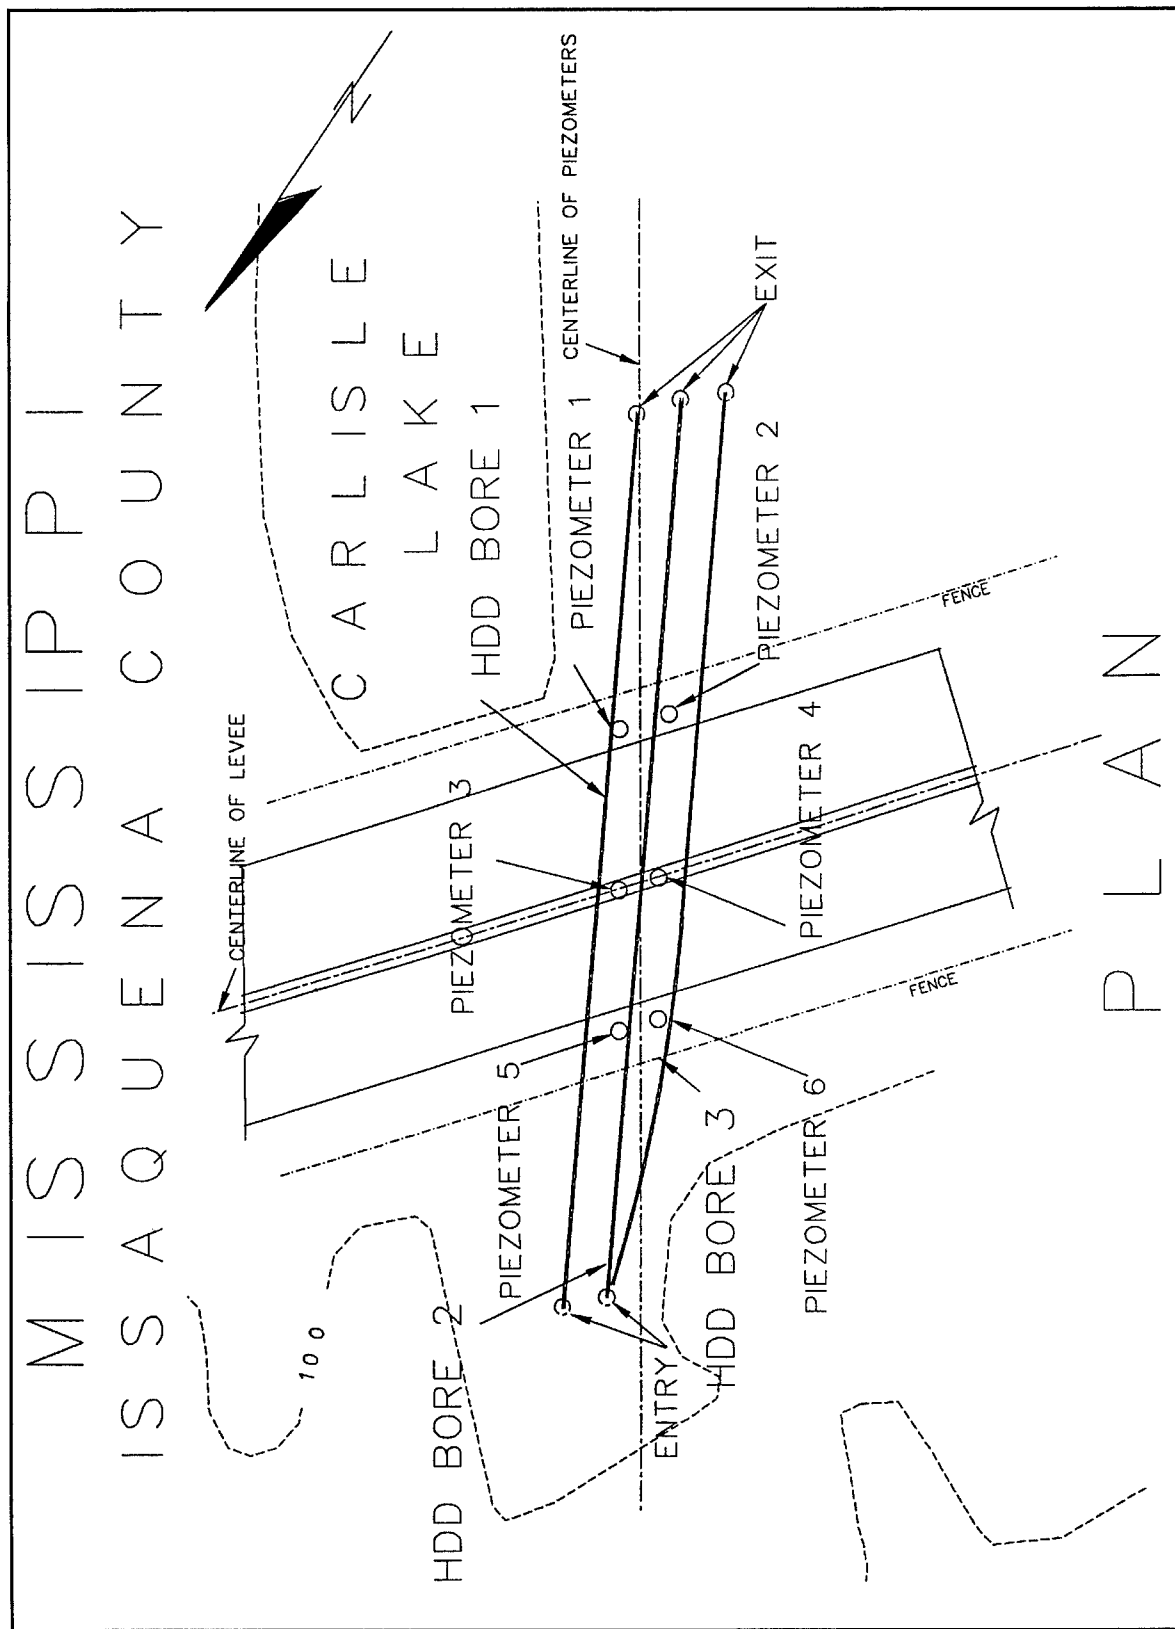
Plan view of test site detailing pipelines and piezometer locations
